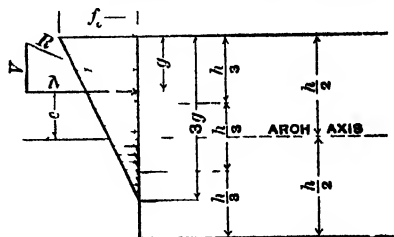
Stresses Caused by a Force Acting Outside the Middle Third of Plain Concrete Section (See p 563)
